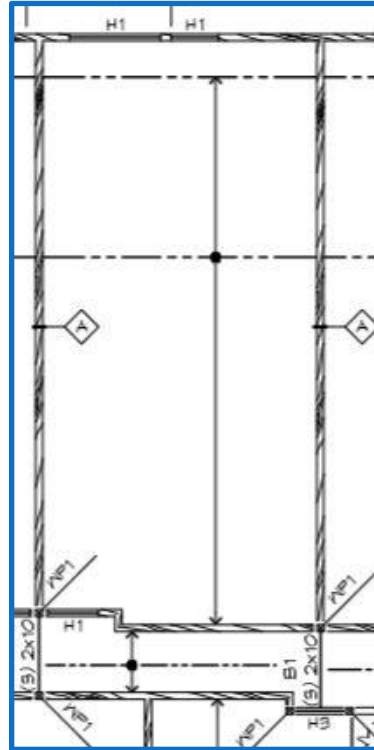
Excerpt From Level 3-6 Structural Plan (KSS)
